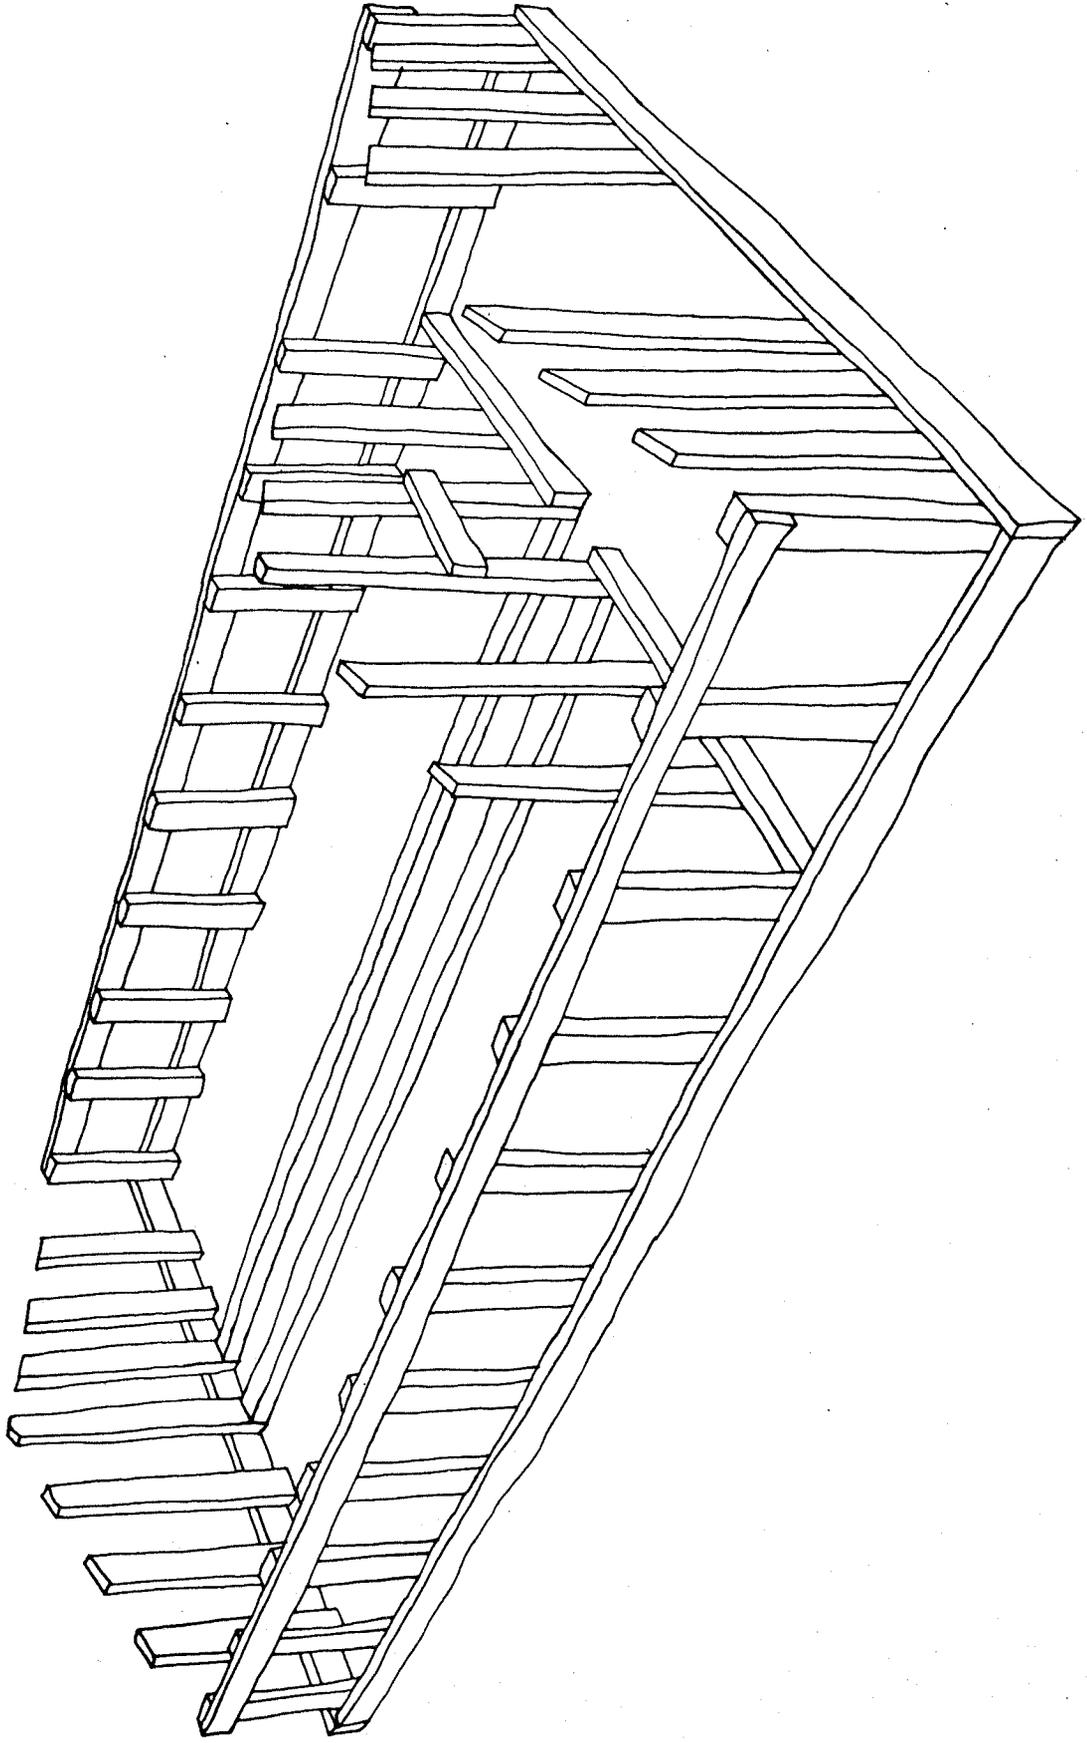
MOIKAU HOUSE RECONSTRUCTION
